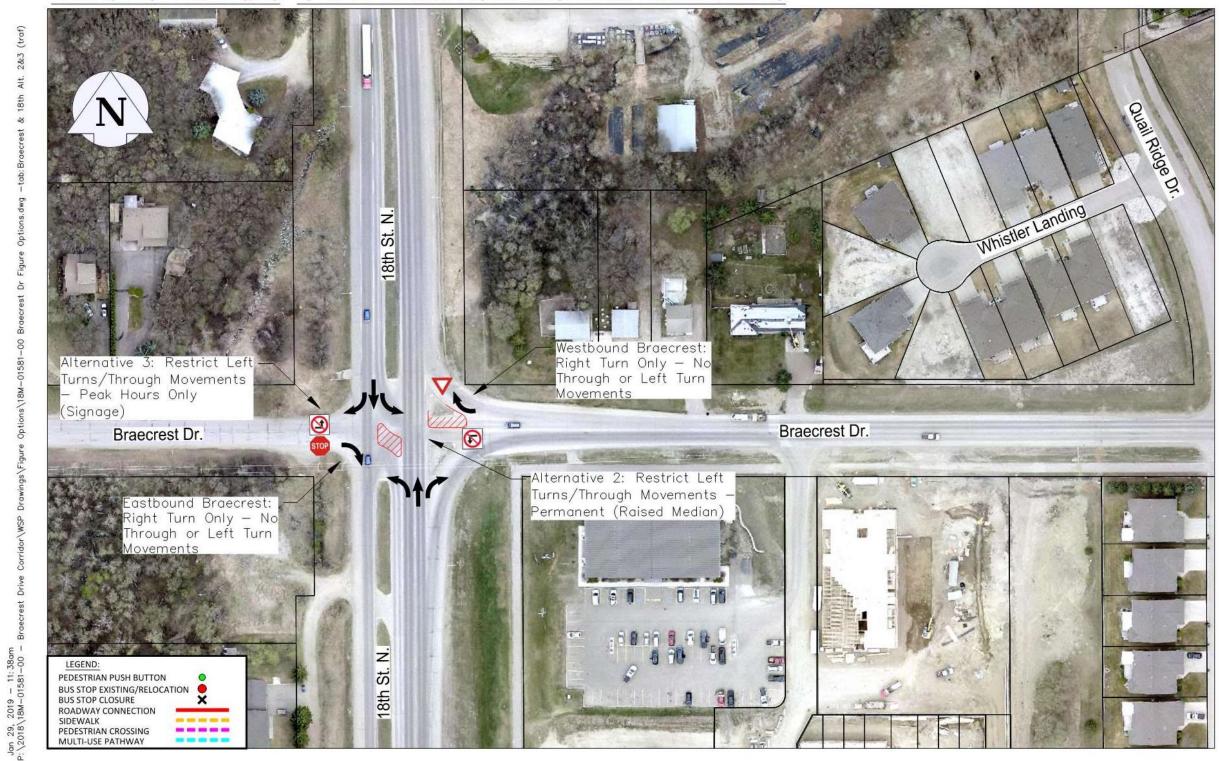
Braecrest Drive and 18th Street North Traffic Management Alternatives 2 and 3
